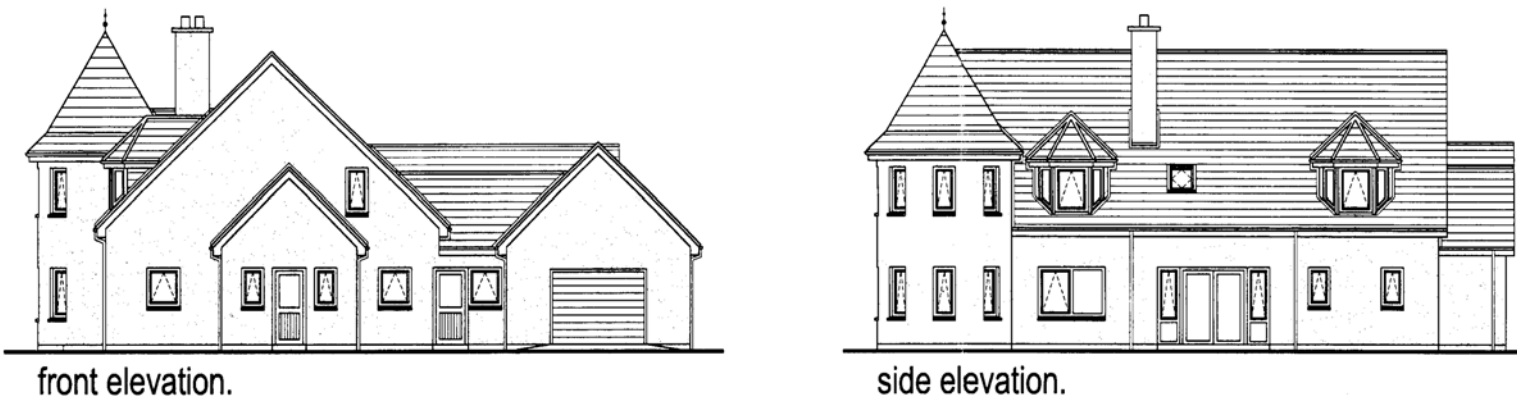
Previously refused dwelling house (CNPA planning ref. no. 05/275/CP)
